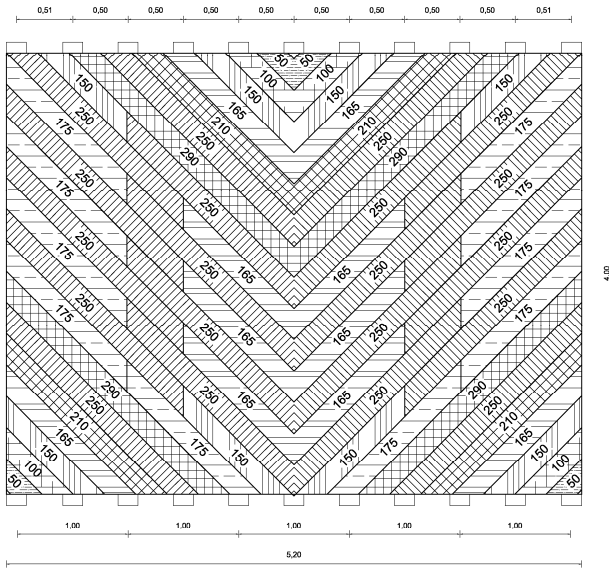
Detail relative to type of elements used for upper layer of reinforcement
